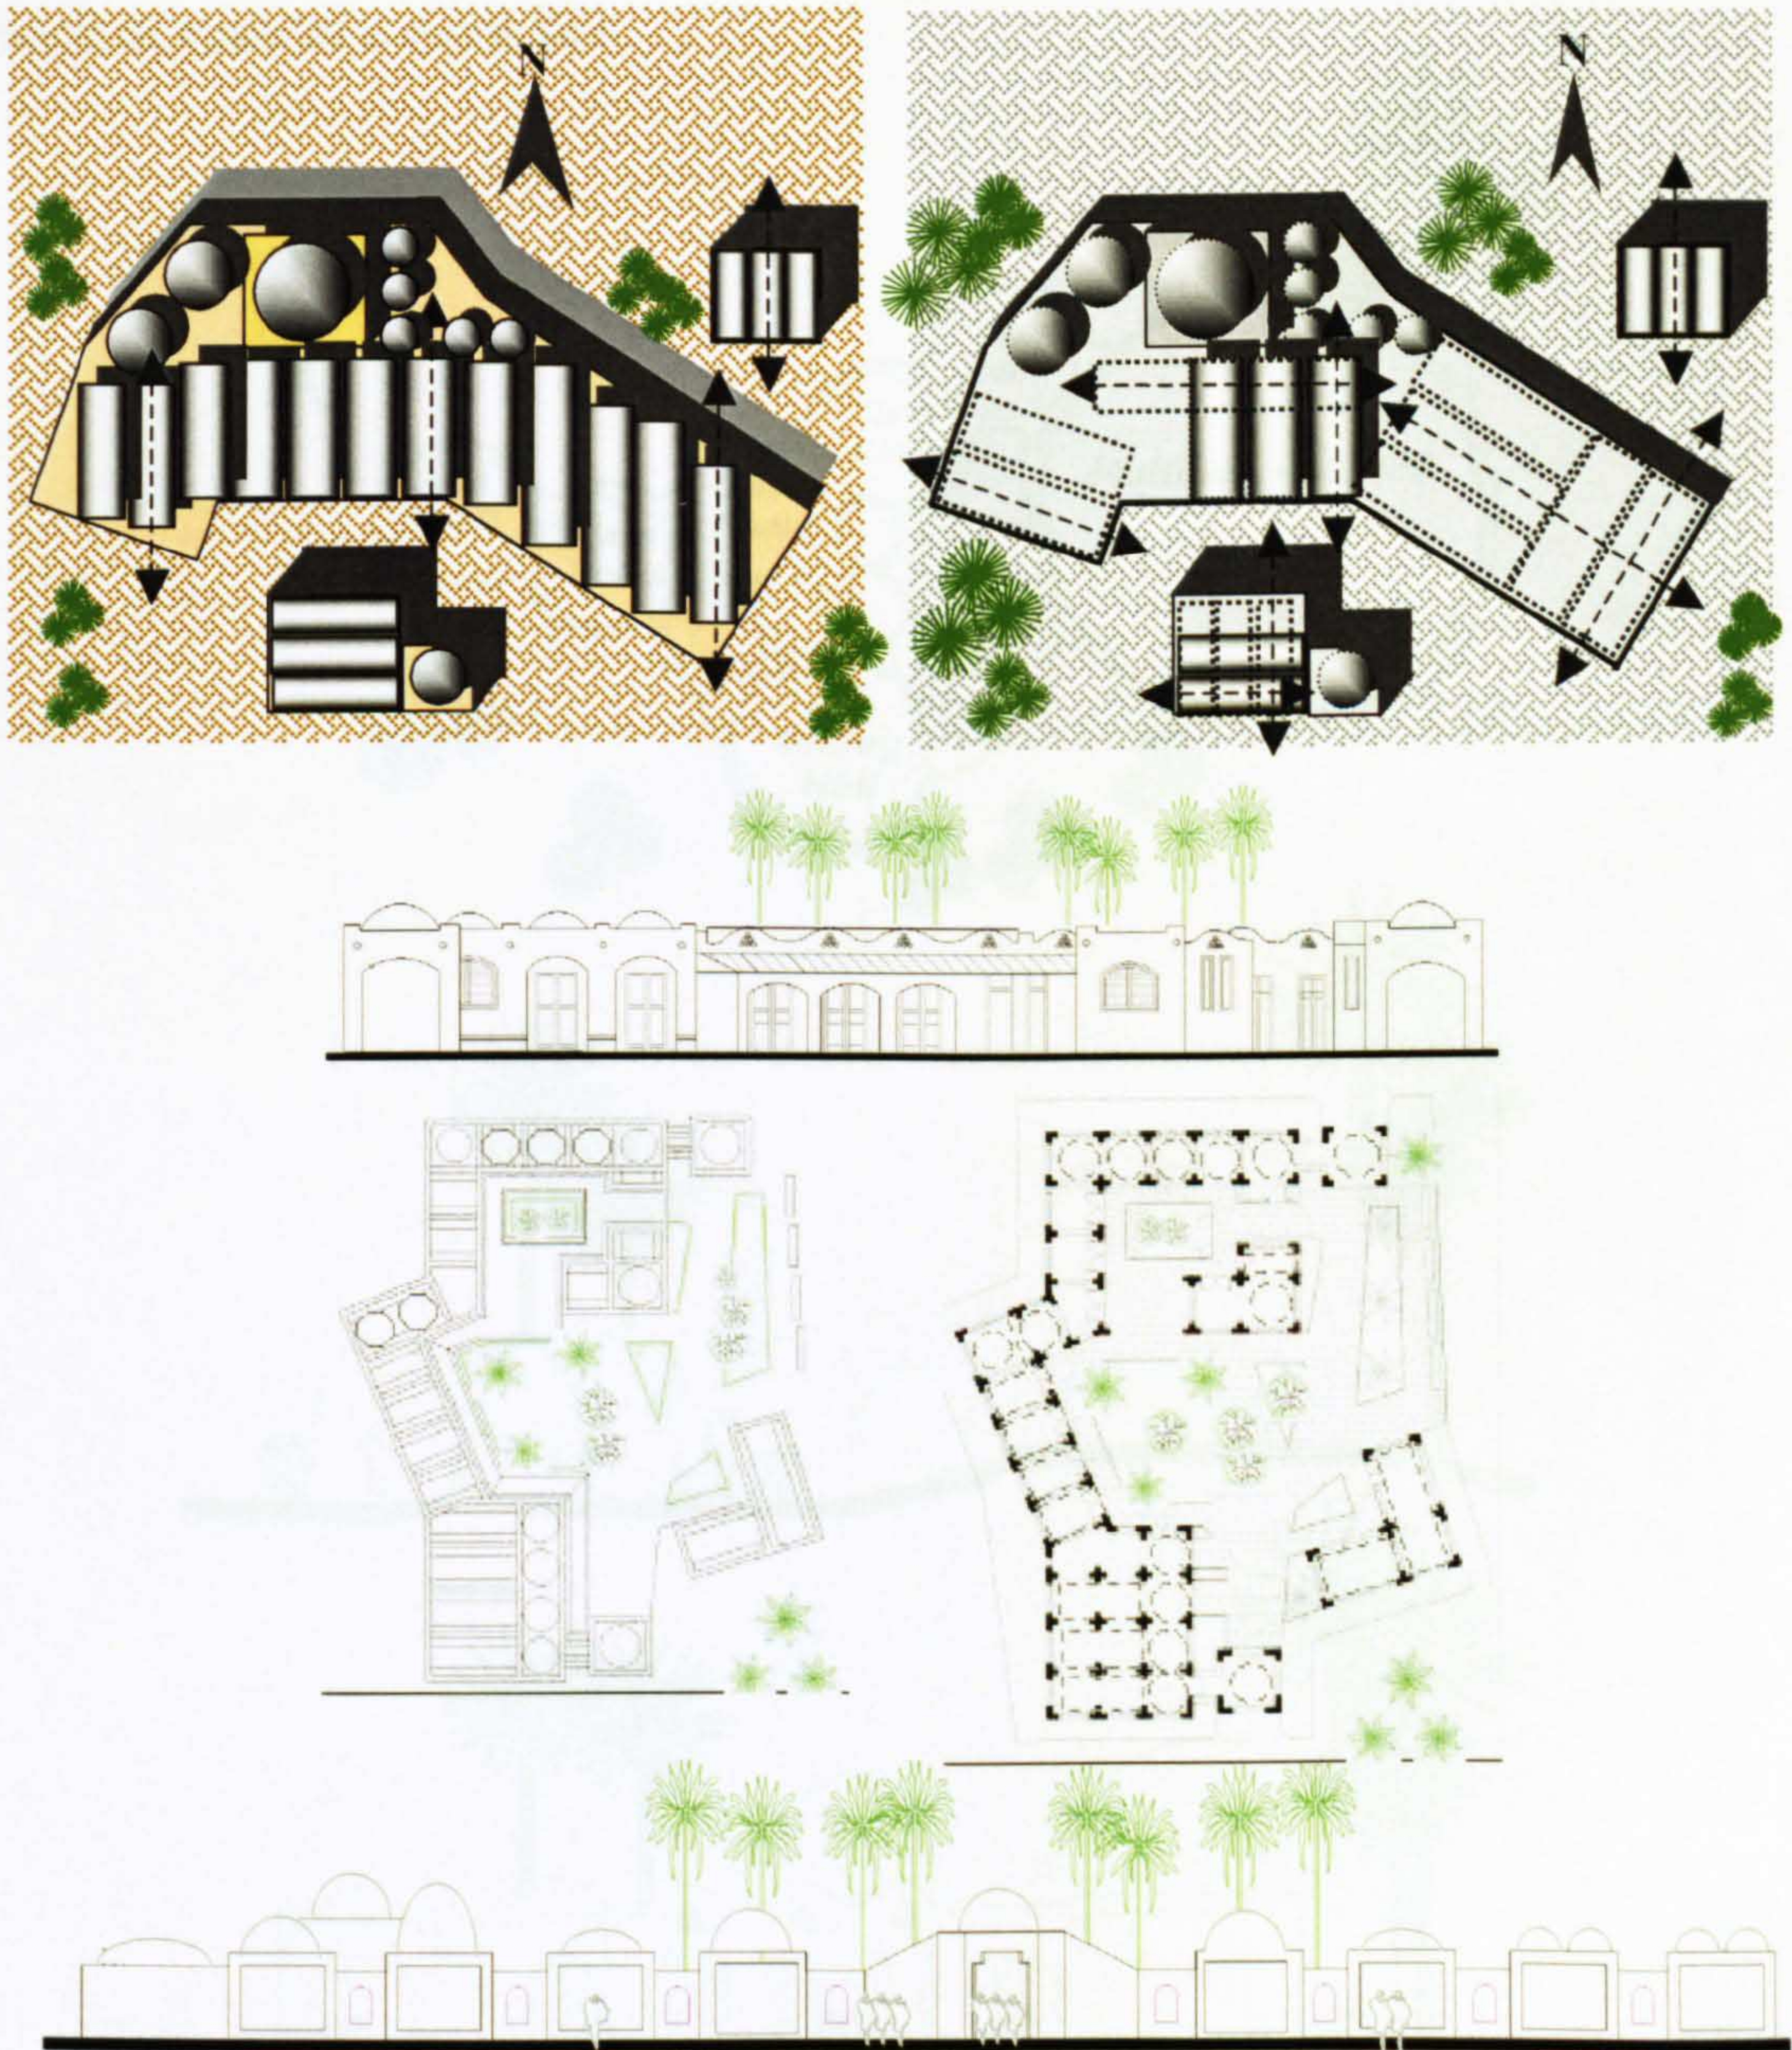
Composition, Orientation and Curvatures of Curved Roofs in Architectural Applications (*Layout, Plans And Elevations*)
